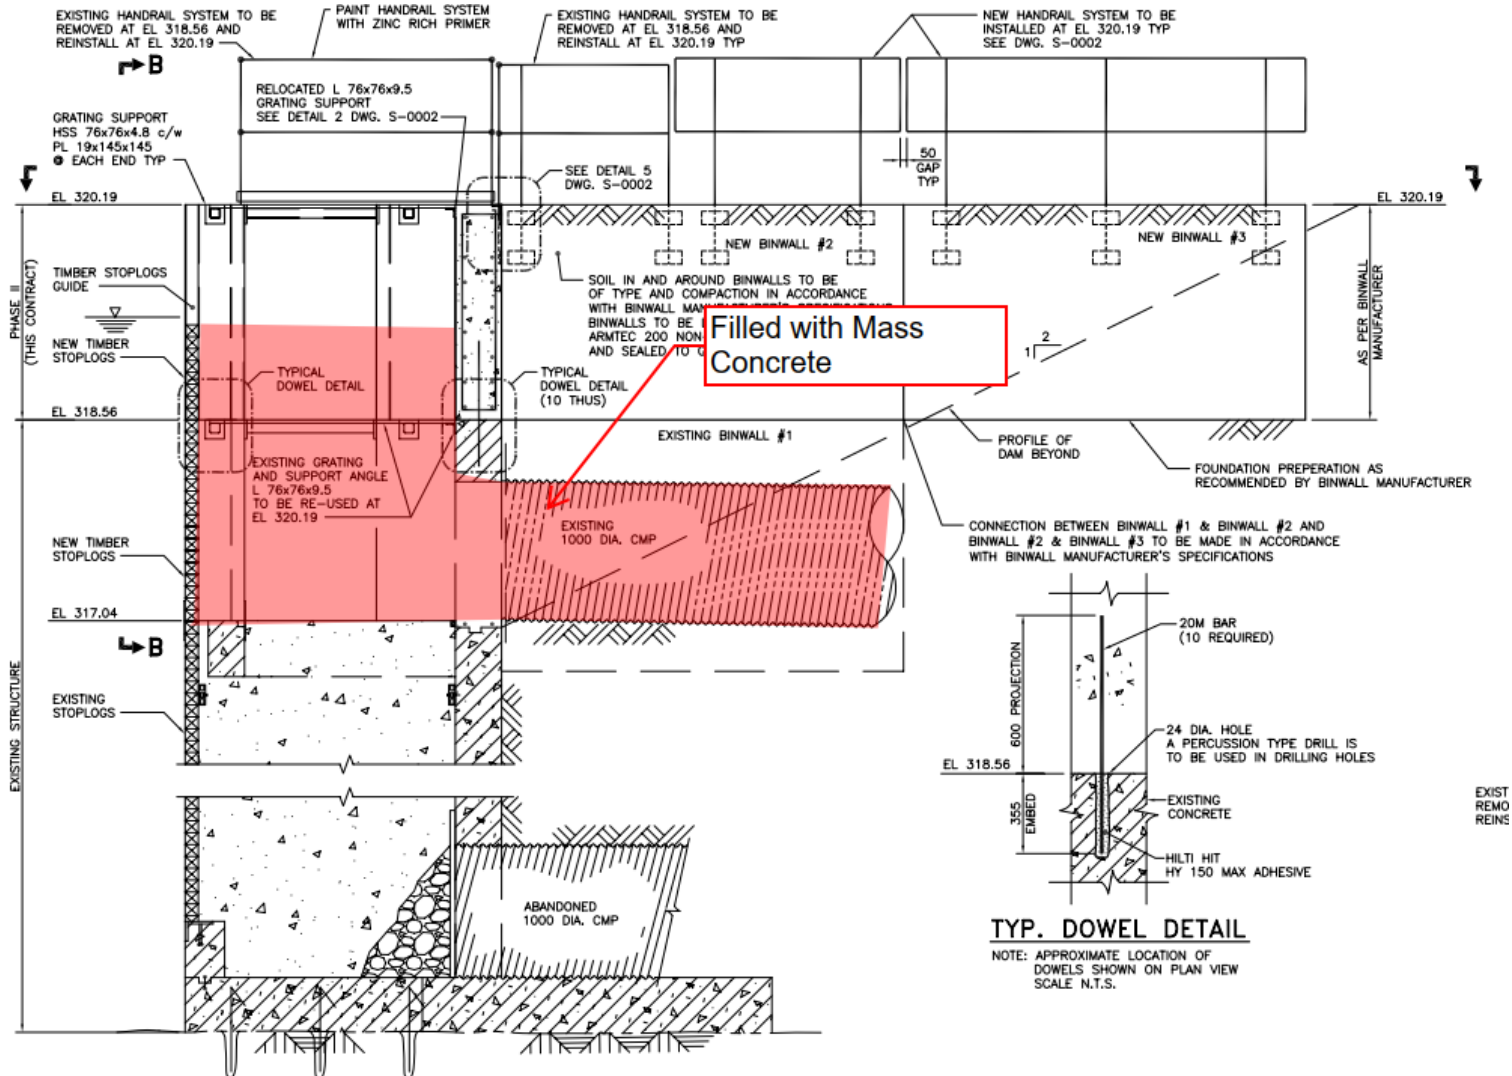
Preliminary plan for the decommissioning of the current Tailings Pond water control structure (MD-1; Hatch 2023b).
